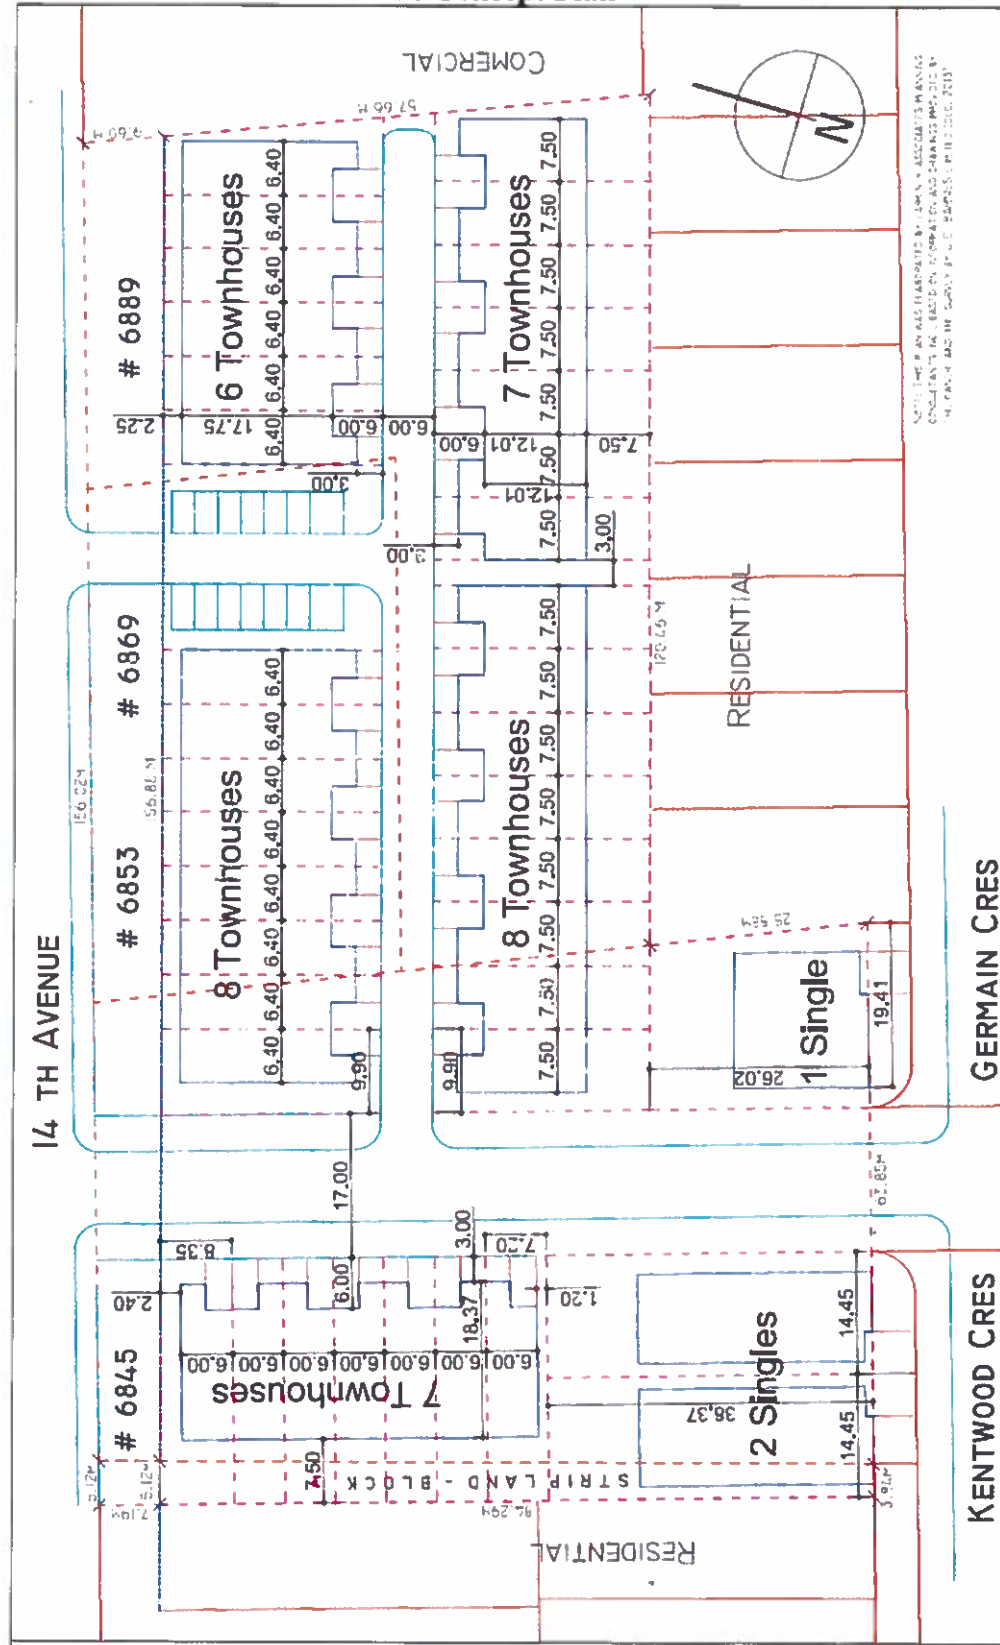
6845 to 6899 14th Avenue Concept Plan
